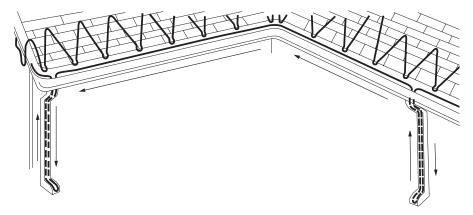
Cable installed along the roofing line in the gutters and drainage pipes
